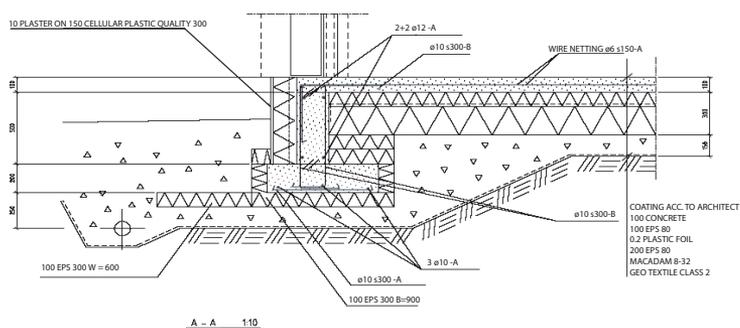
Foundation construction (Drawing: WSP Construction).
